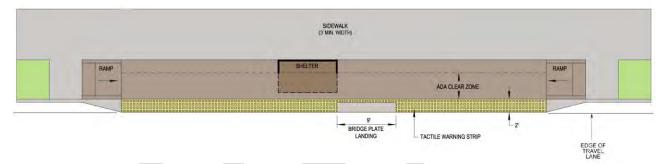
Station Stop without Parking; Sidewalk behind Shelter
